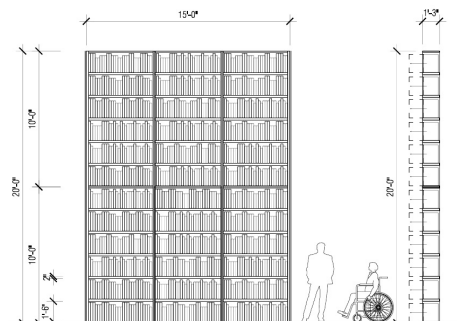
Set wall elevation drawing (drawn by Arjuna Imel).
